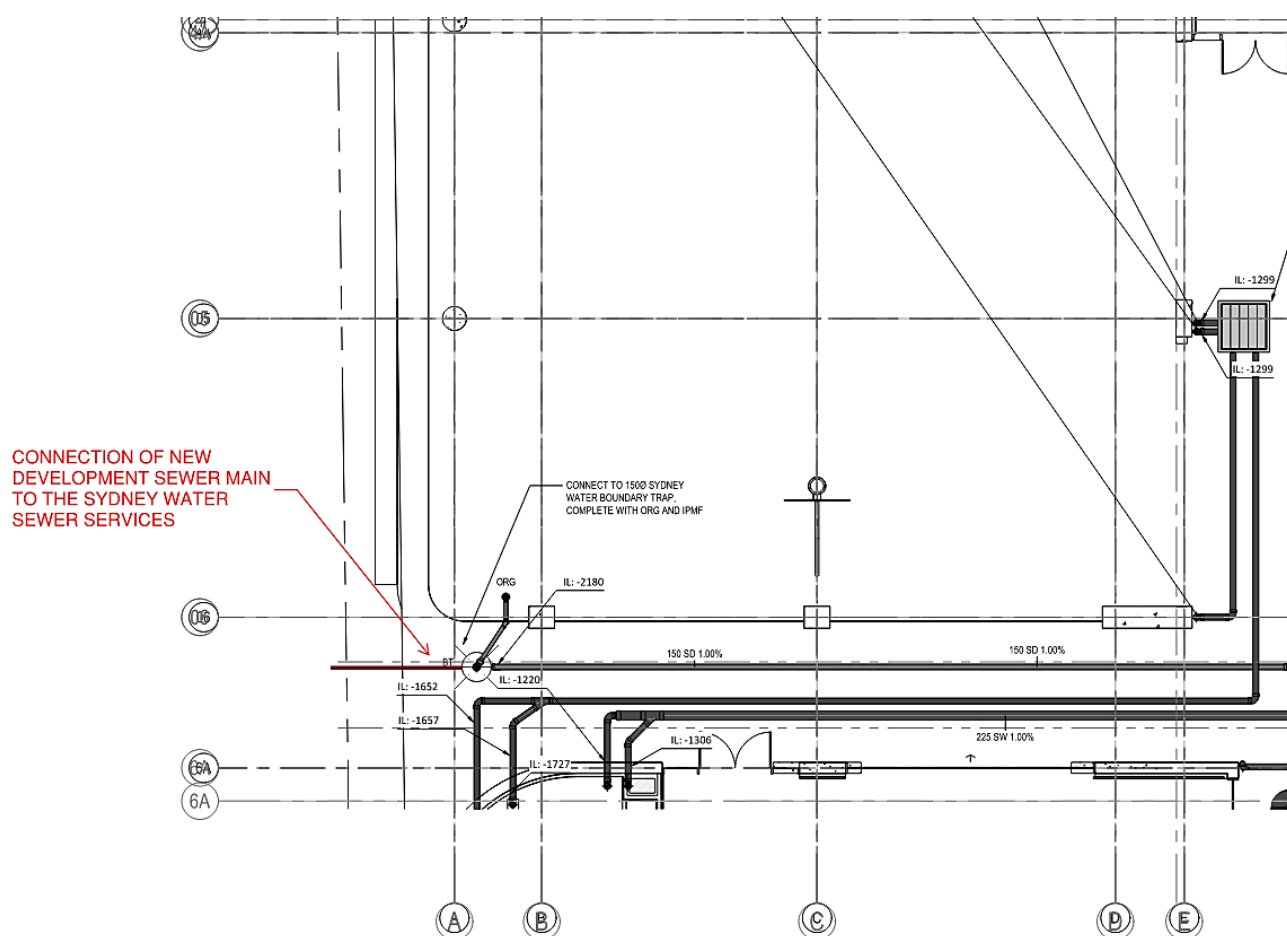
Extract from Hydraulic Services Drawing; Sewer and Stormwater - Level 00 - North
